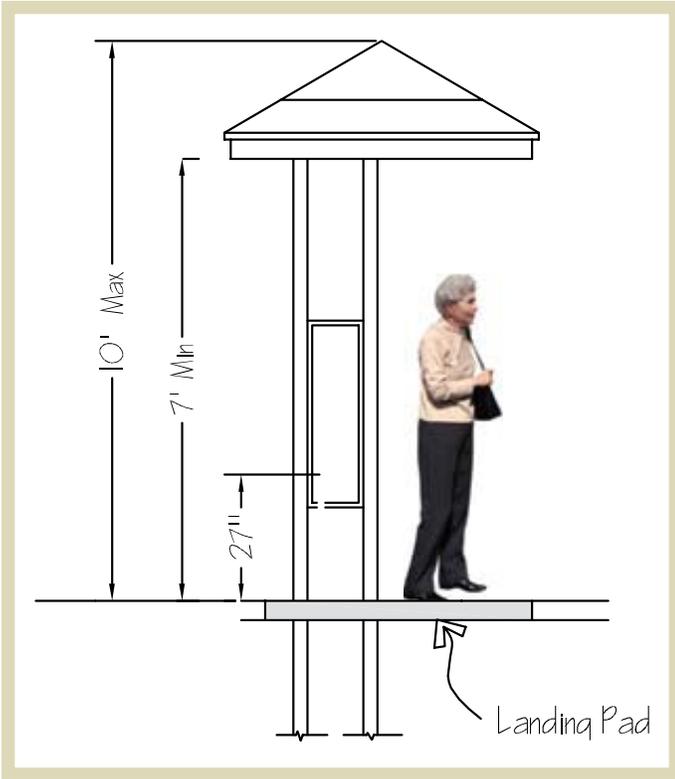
| Cross-section of a small bus shelter with a leaning rail but no seating, with typical vertical dimensions.
